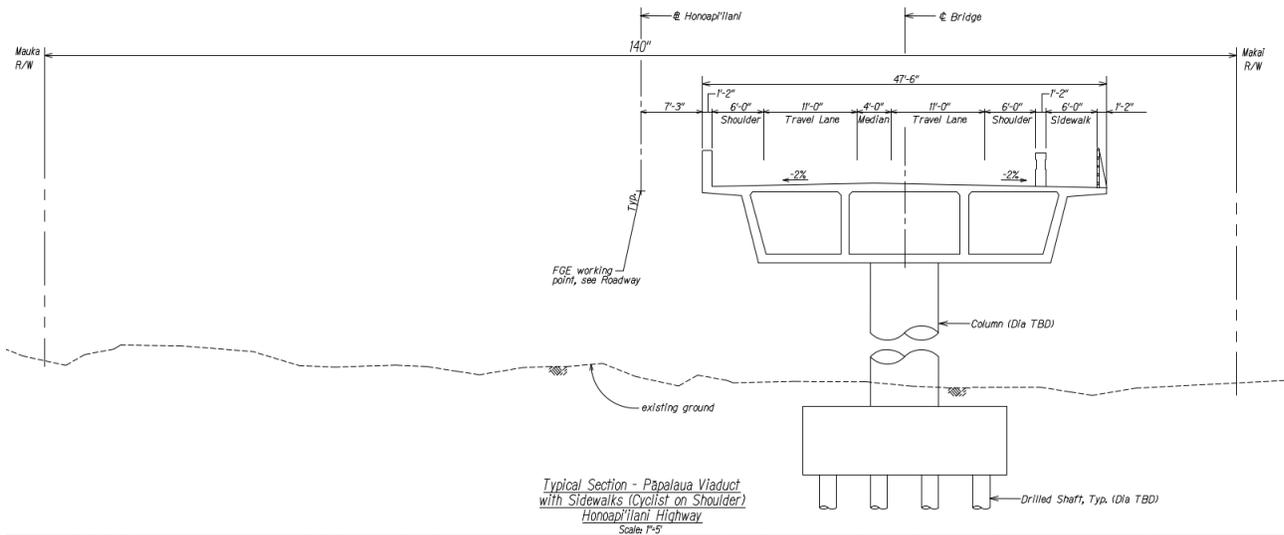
Typical viaduct section on pile foundation. (Image credit: FHWA)
